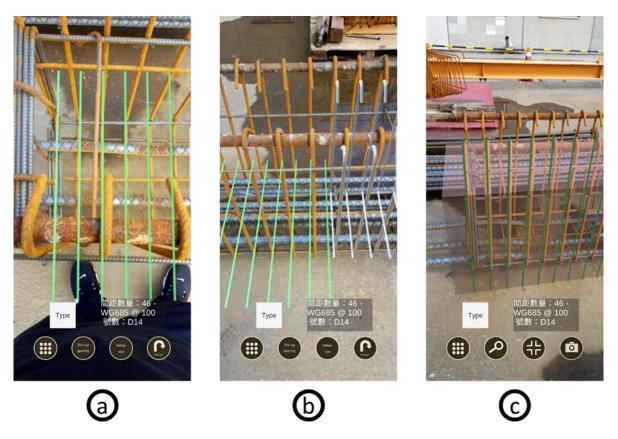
Snapshots of the AR-supported rebar inspection application in spacing inspection task. (a) On the left side of the stirrups, planar virtual bars are superimposed well on the bottom part of the stirrups. (b) In the middle of the stirrups, stirrups have a little deviation from the planar virtual bars. (c). The orientation of the planar virtual bars is changed to superimpose vertically on the front side of the stirrups
